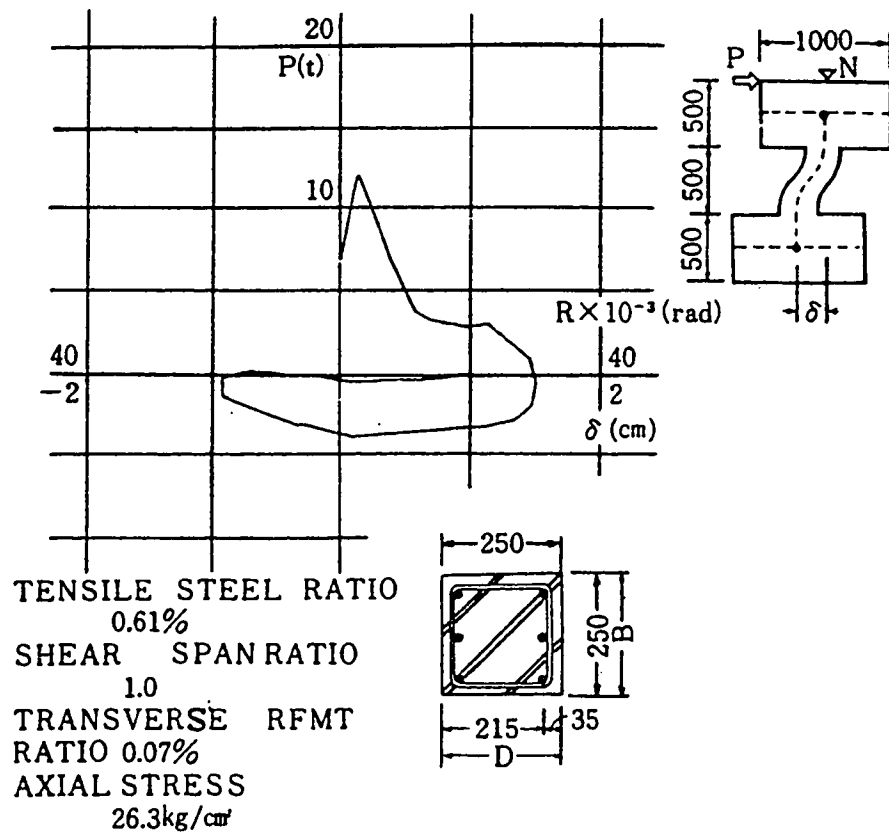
Shear Strengthening of Columns by the Use of Concrete Jackets, Details & Response of the Unretrofitted Column, Ref.[26].
